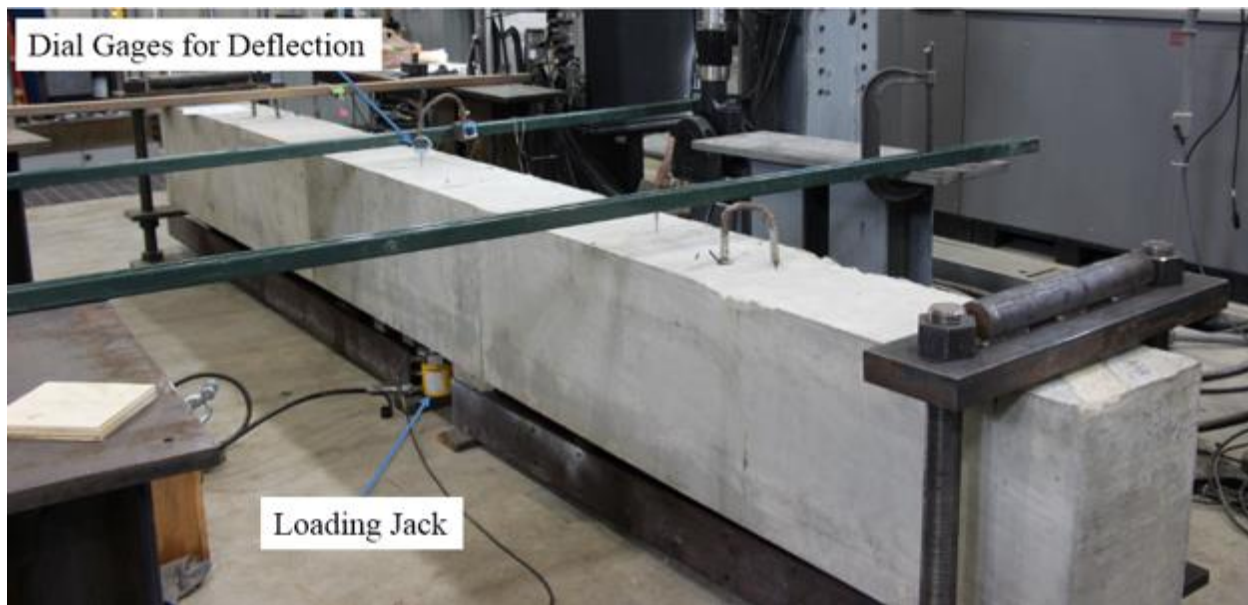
Test Setup for Testing of a 16-ft. Slab
